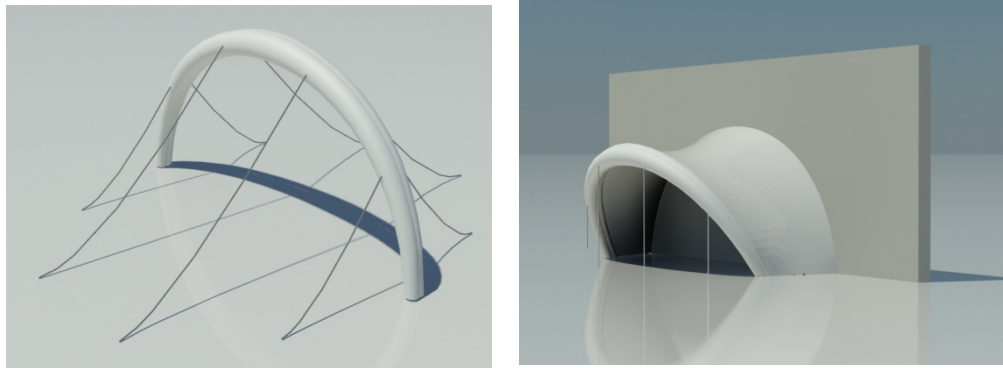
SINGLE ARCH CONFIGURATION: STABILIZATION BY CABLES OR AGAINST A WALL
